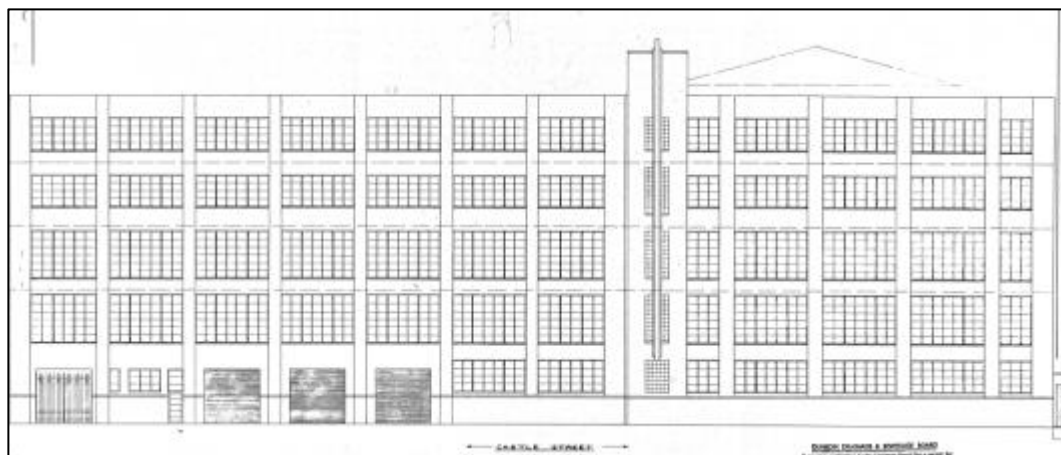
1968 Castle Street façade change to Block 4 and 5 Biscuit Factory and Dispatch Building (DDC Archives).
